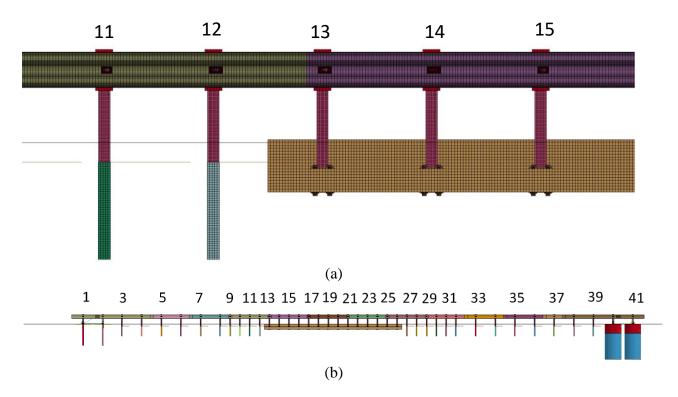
Culvert-Mounted MGS Model: (a) Transition from Half-Post Spacing MGS to Culvert-Mounted MGS; and (b) System Installation Model Overview
